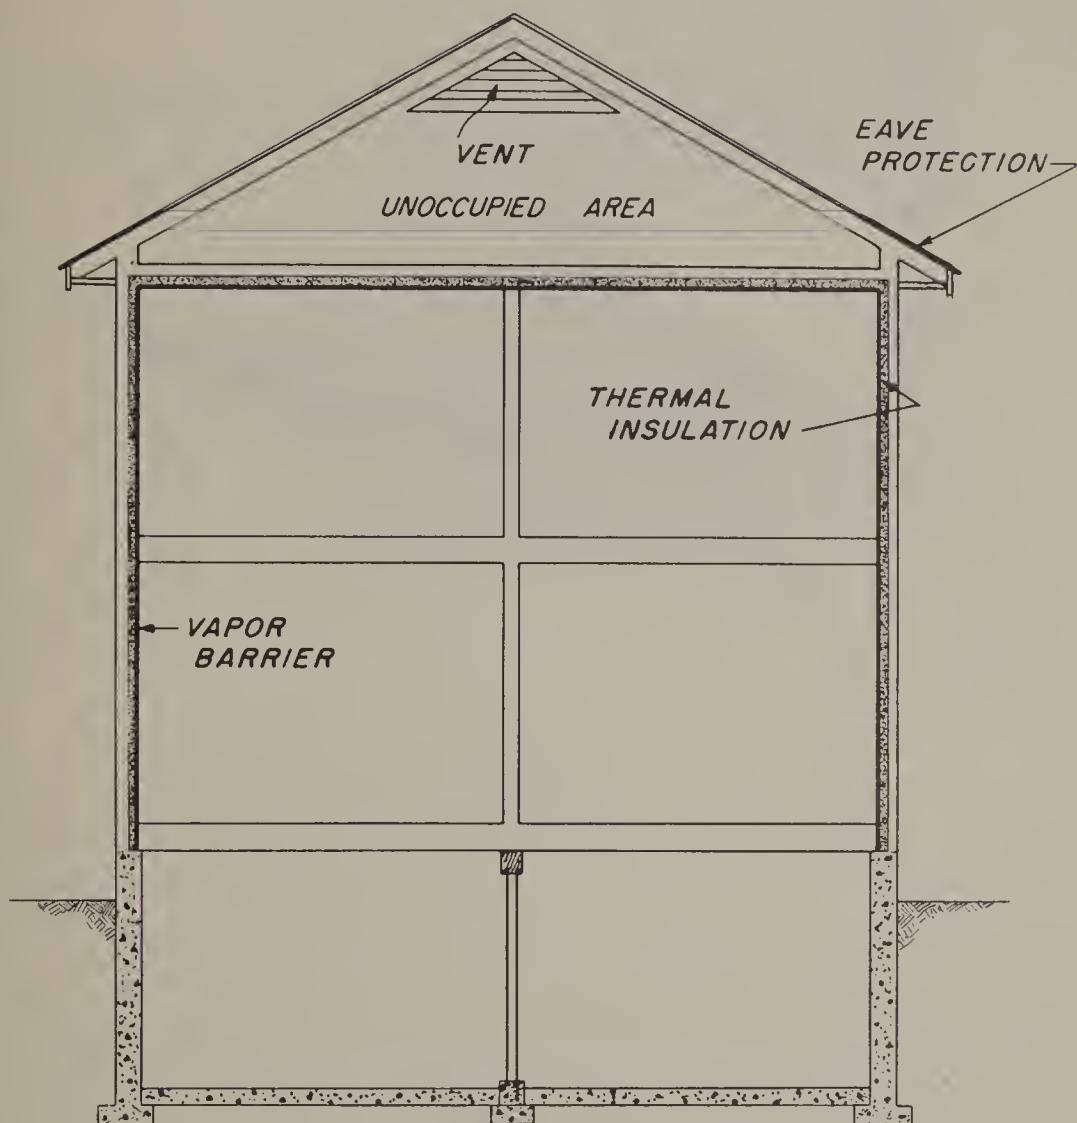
Two-story house with basement.* Condensation control is obtained by means of a vapor barrier and ventilation. The vapor barrier should follow the inside line of the insulation and should effectively close the space between first- and second-floor joists. Vapor barriers should be provided in condensation zone I for ceilings and walls, and in zone II for walls. Ventilation for the attic space should be provided in all three zones. Thermal insulation should be applied to form an envelope around the heated living quarters above the basement in zones I and II. Eave protection in the form of roll roofing is recommended below the shingles and over the eaves in zones I and II. (See figs. 50 and 51.) In zones I and II ice dams sometimes form over the eaves causing water from melting snow or rain to back into the house.
